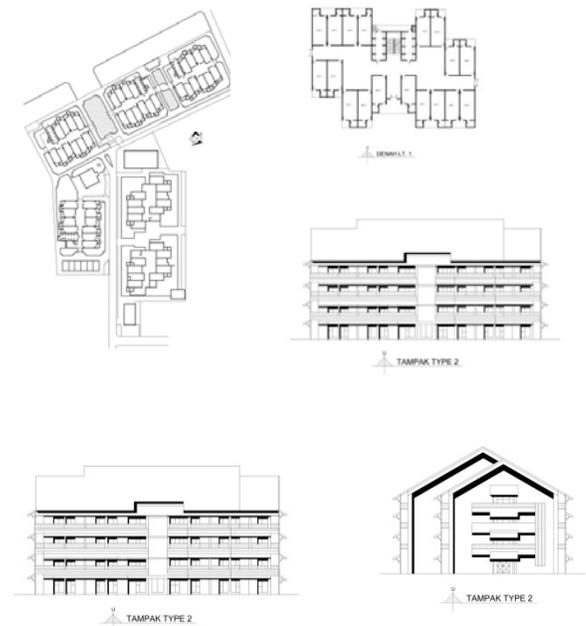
Layout plan and elevation of Sombo building, Surabaya
